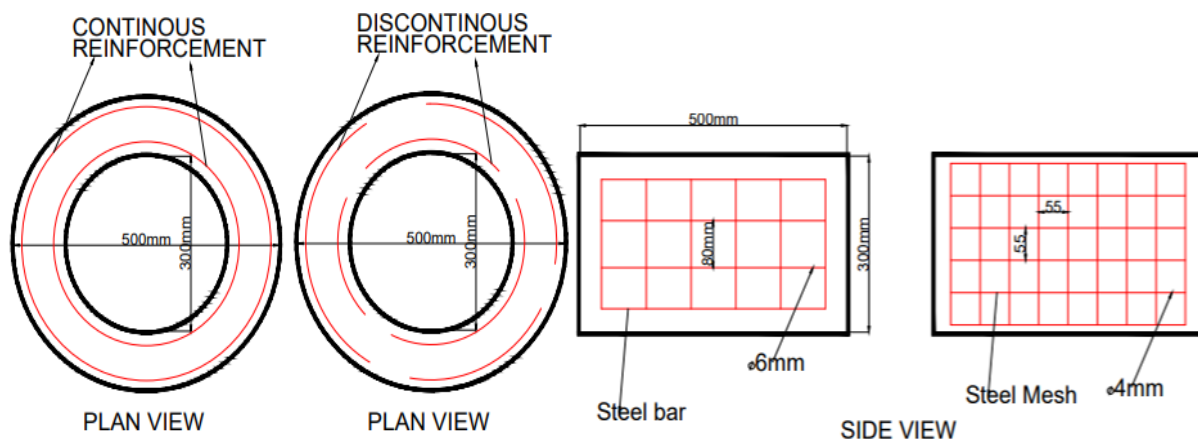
Detailing of the steel reinforcement and mesh in the concrete
